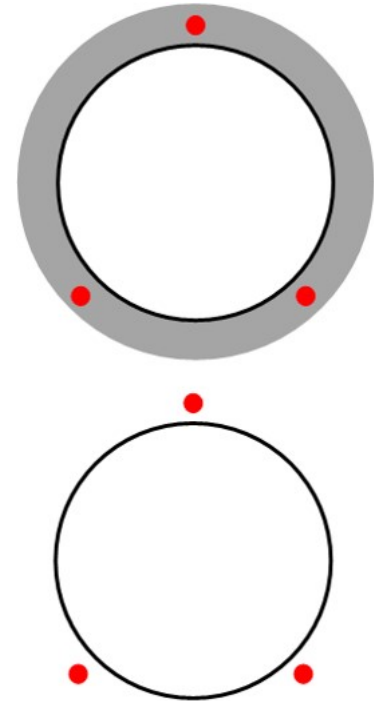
Cross sections of pipe at concrete ring and in between span
